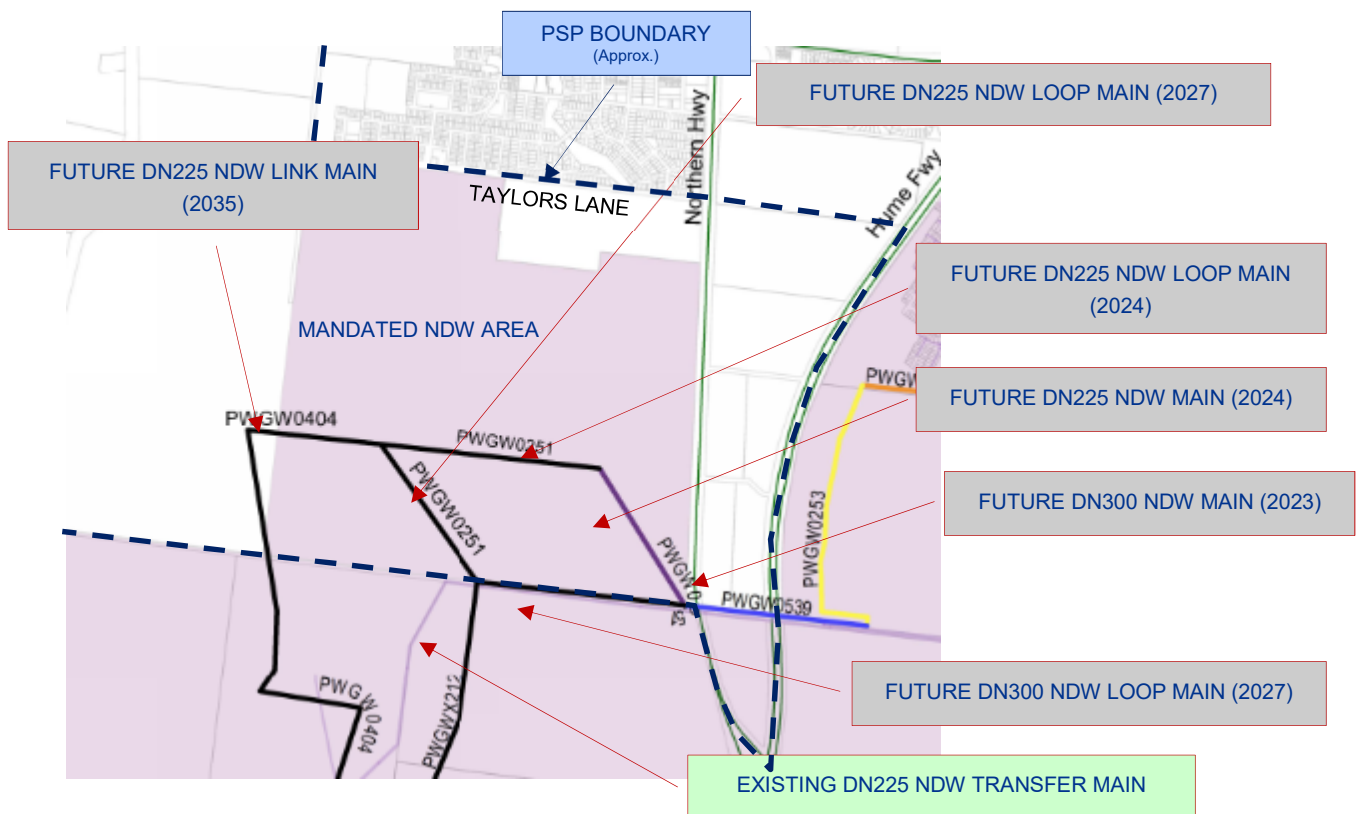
YVW Beveridge Wallan Planned NDW Assets - Refer Appendix A.2.2 (Not To Scale)
